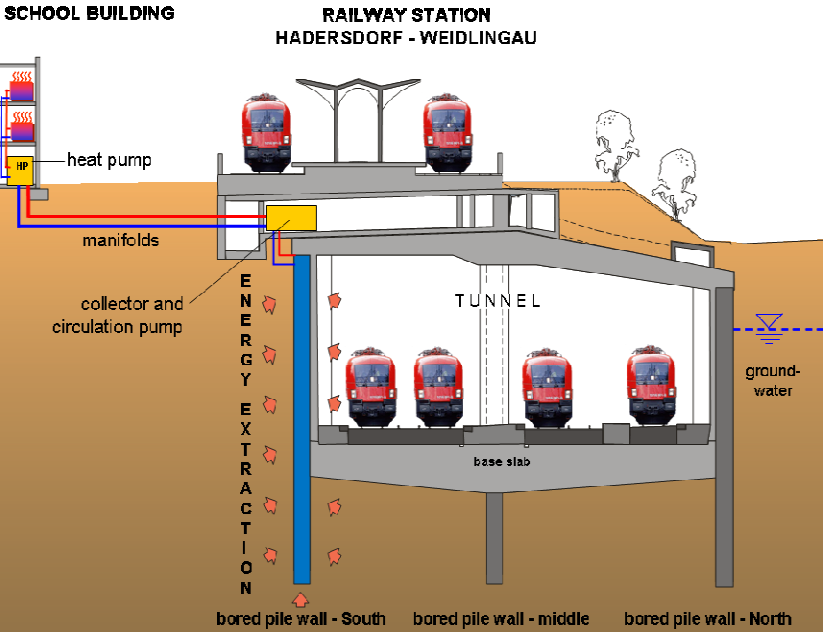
Energy transfer from pile walls of the tunnel to the school building.
